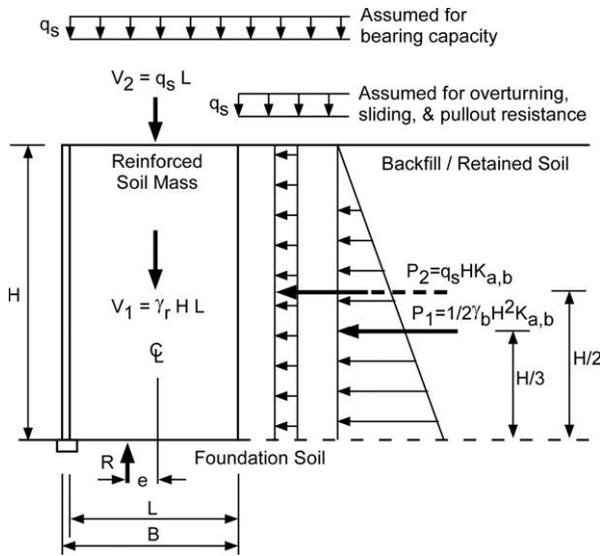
Reinforced soil retaining wall schematic and forces involved in external stability analysis.
